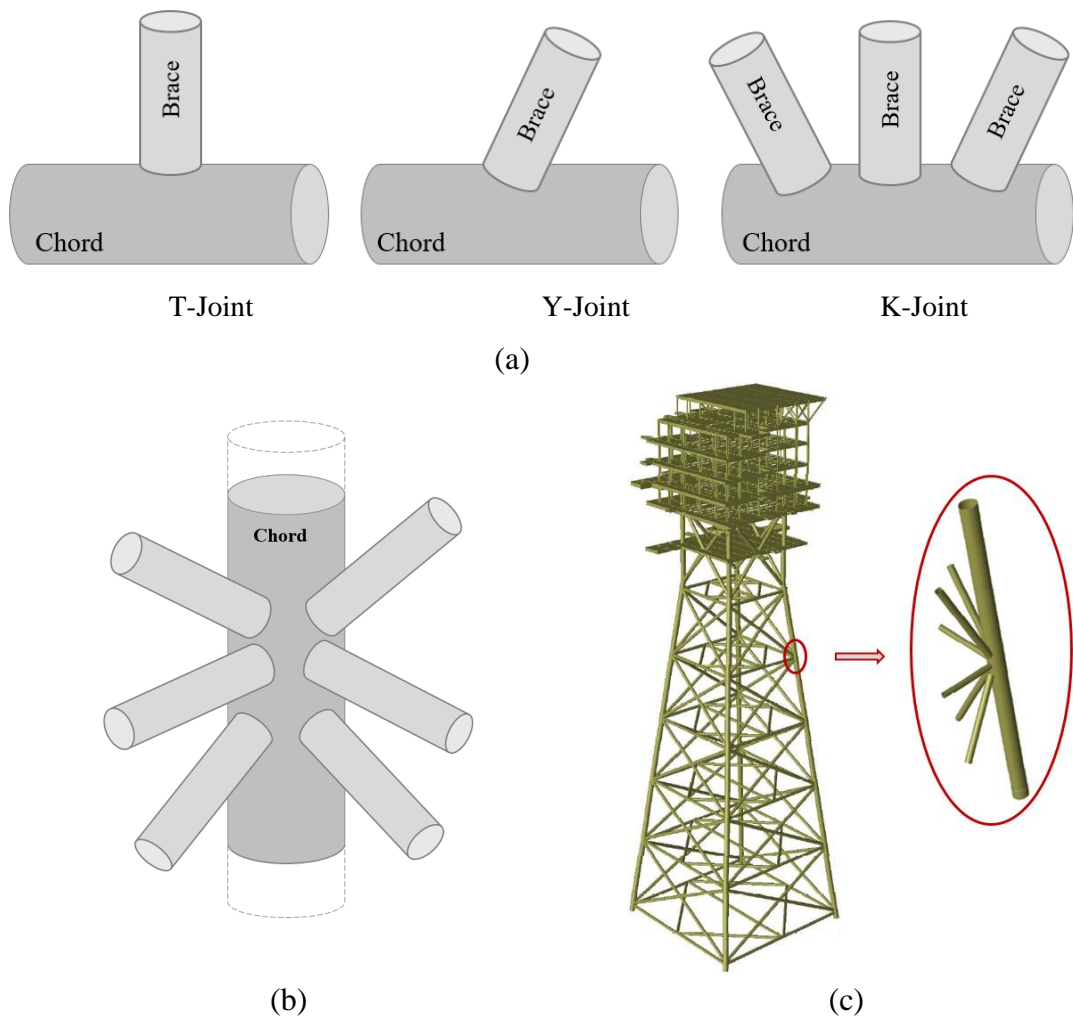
Simple welded joints, (a) planar joints, (b) a multi-planar joint, (c) offshore jacket platform
